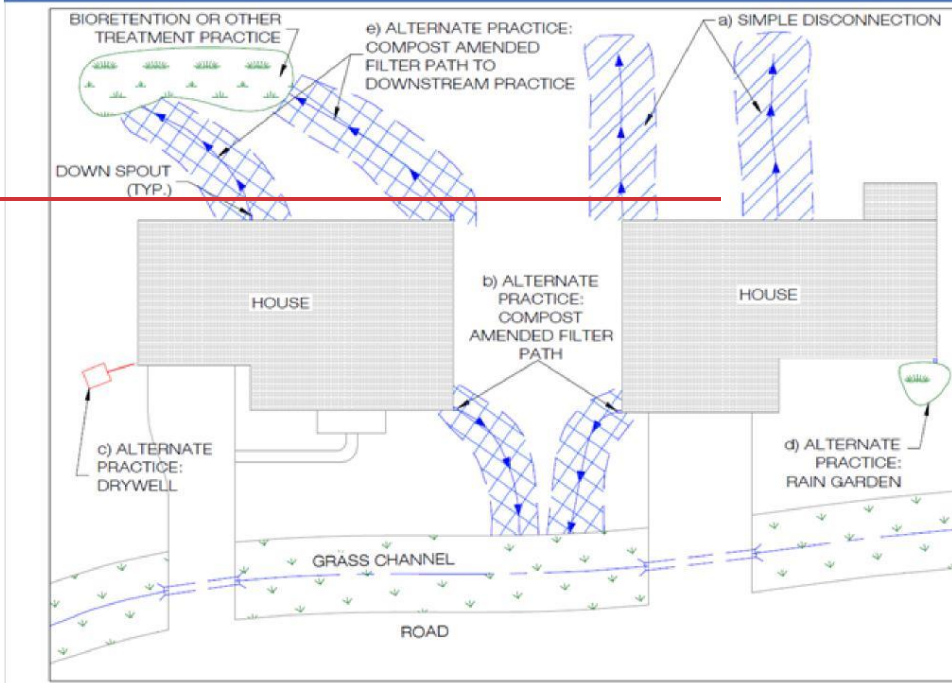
Residential Rooftop Treatment – Plan View
